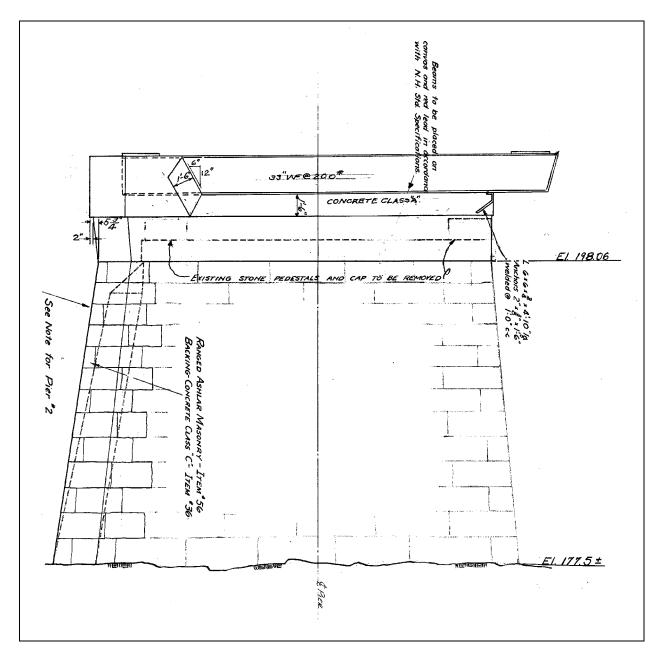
Pier 2 (west pier) elevation drawing (Source NHHD 1936, Bridge Drawings, Sheet 7 of 21; NHDOT Digital File 50146POP007.tif).
